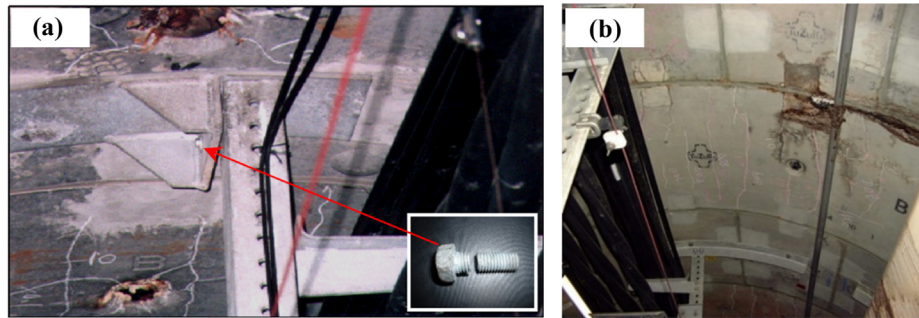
(a) Broken bolts at steel cable shelf; (b) cracks at the crown of the segment.
